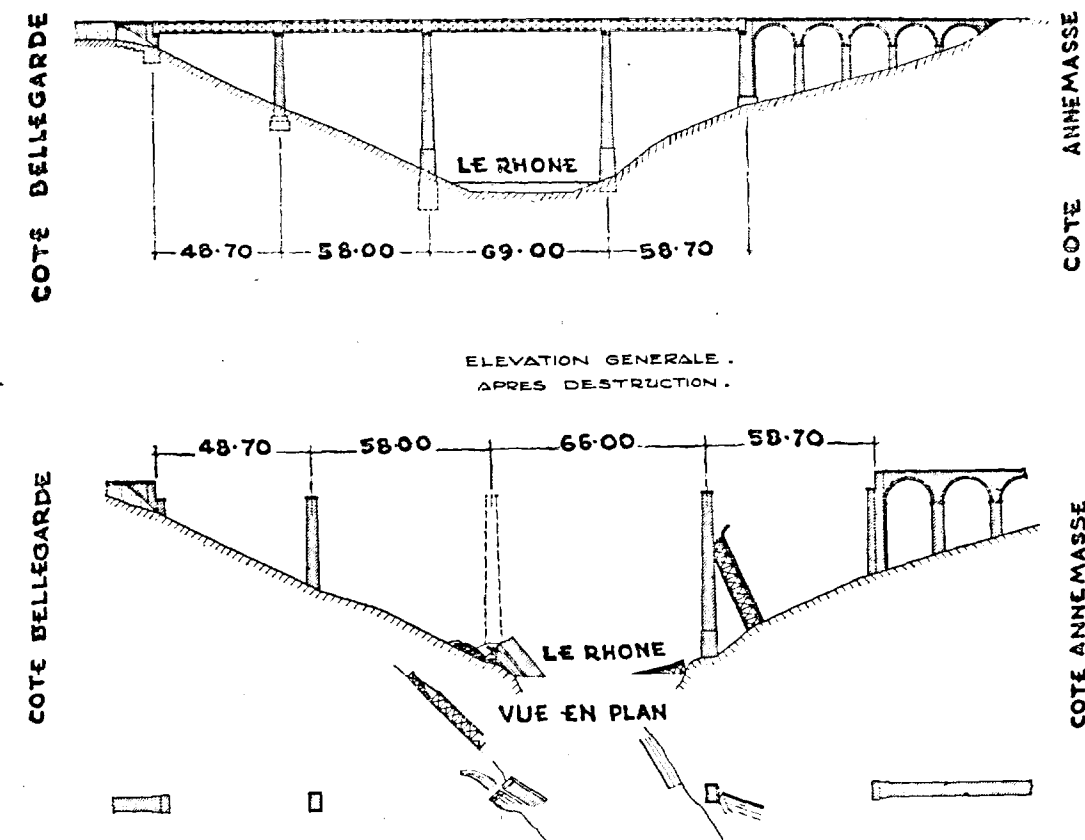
Longeray Viaduct. Elevation of old bridge—before destruction & Elevation of old bridge—after destruction
